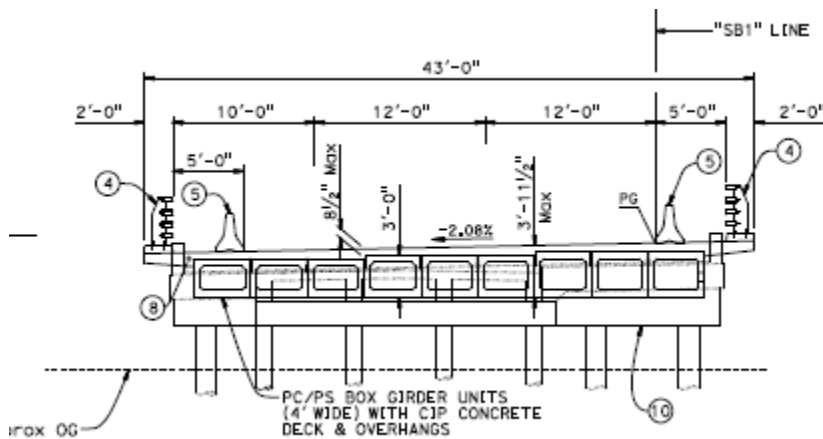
Cross section of Jacoby Creek Bridge showing locations of CISS piles.
